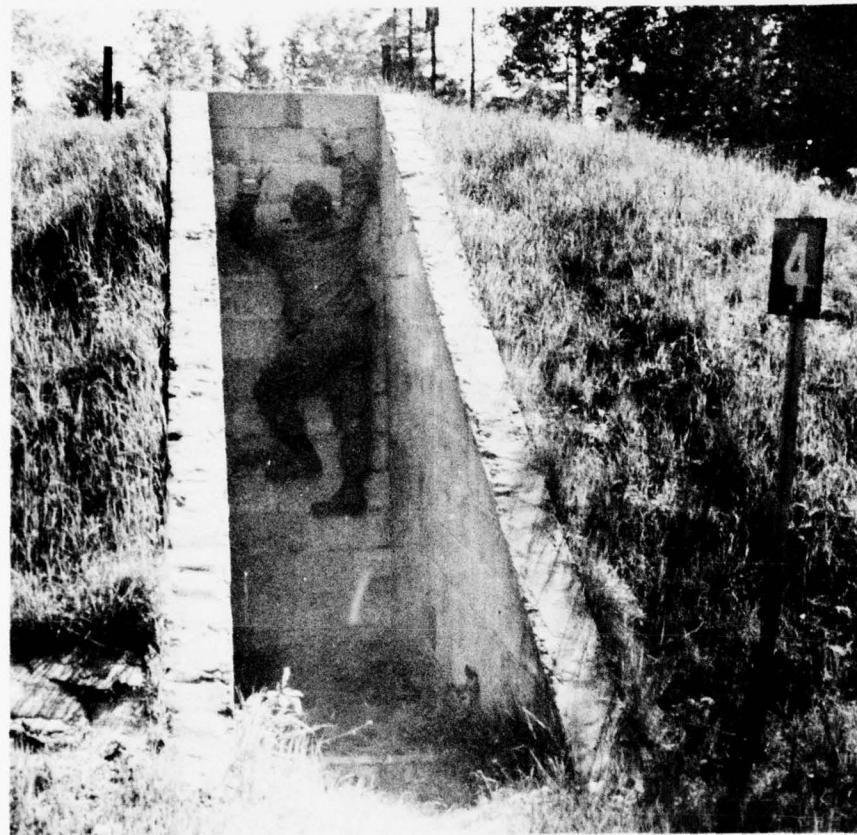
Vertical Wall, 0.9 m wide x 3 m high, made of 21-cm-high concrete blocks set in 4-cm steps. Subject climbs wall to top of small hill, rubbing clothing on concrete.
